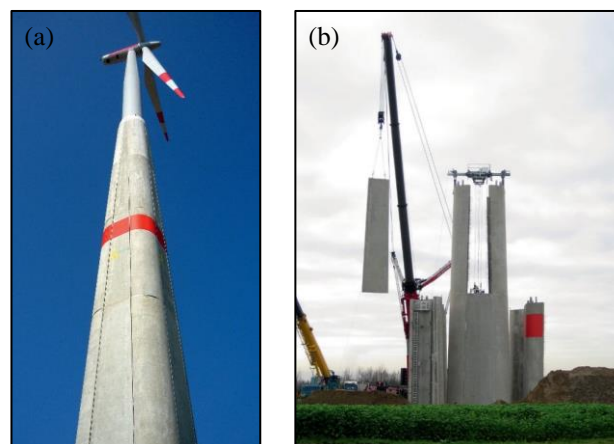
Concrete-steel hybrid tower with 133 m hub height
